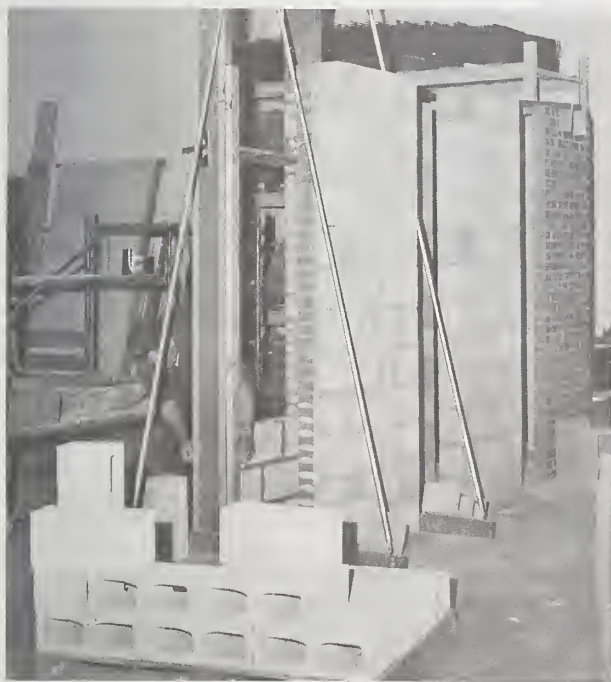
Eight-ft brick, hollow concrete block and composite wall specimens.
